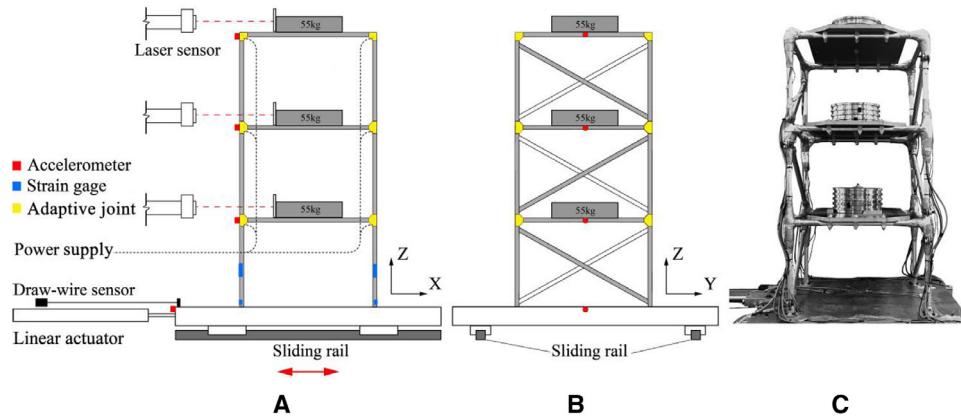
Experimental setup: front (A) and side (B) view, (C) three-story adaptive frame prototype
